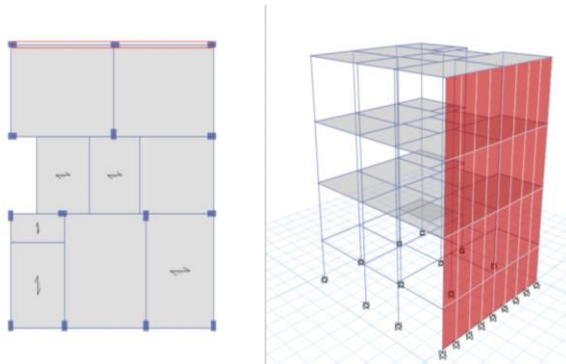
Plan And 3D View of Residential Building with Shear wall
